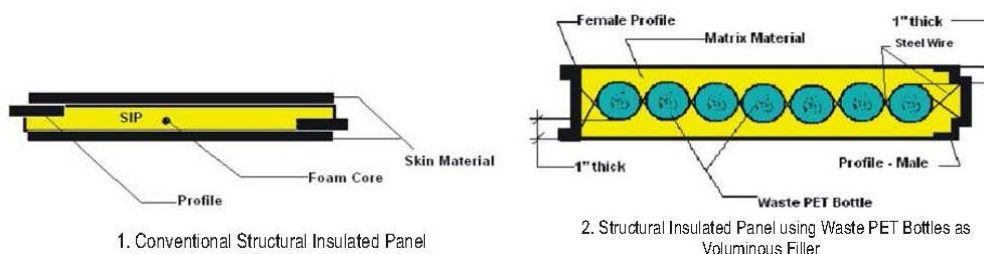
Comparative experiment between normal concrete panel and sandwich panel wall
